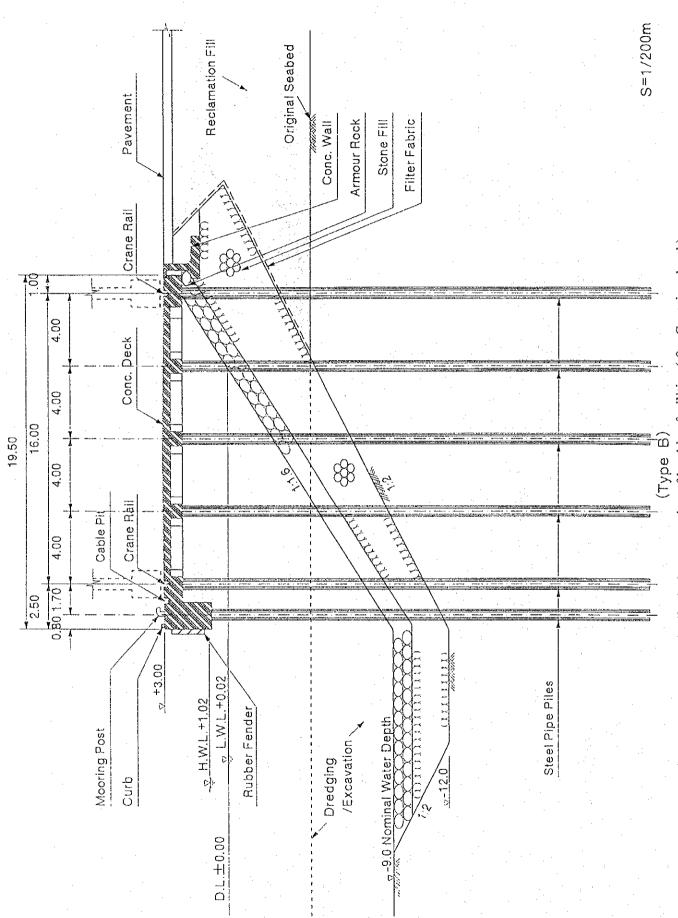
Typical cross section of berthing facilities (-9m Container berth)
